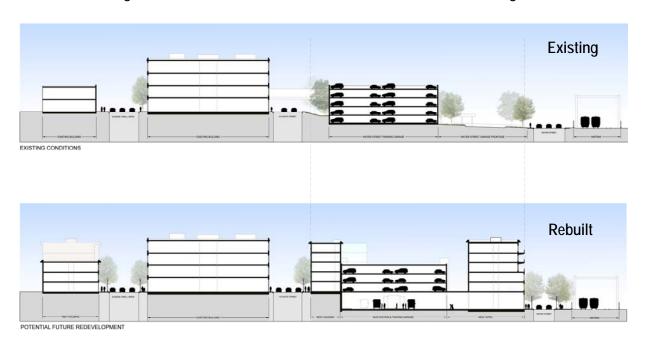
shows an existing cross-section of the Water Street parking garage and a potential cross-section of the new Greyhound and SEAT bus terminal / rebuilt parking garage wrapped with housing (fronting Atlantic Street) and a hotel (fronting Water Street) at the location shown in Figure 5-26.
